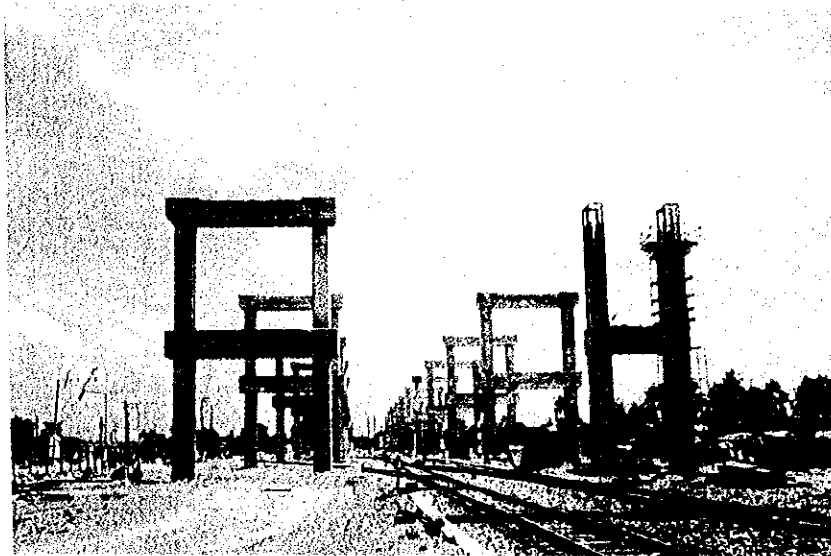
Hopewell Project under Construction (at Bang Sue)
